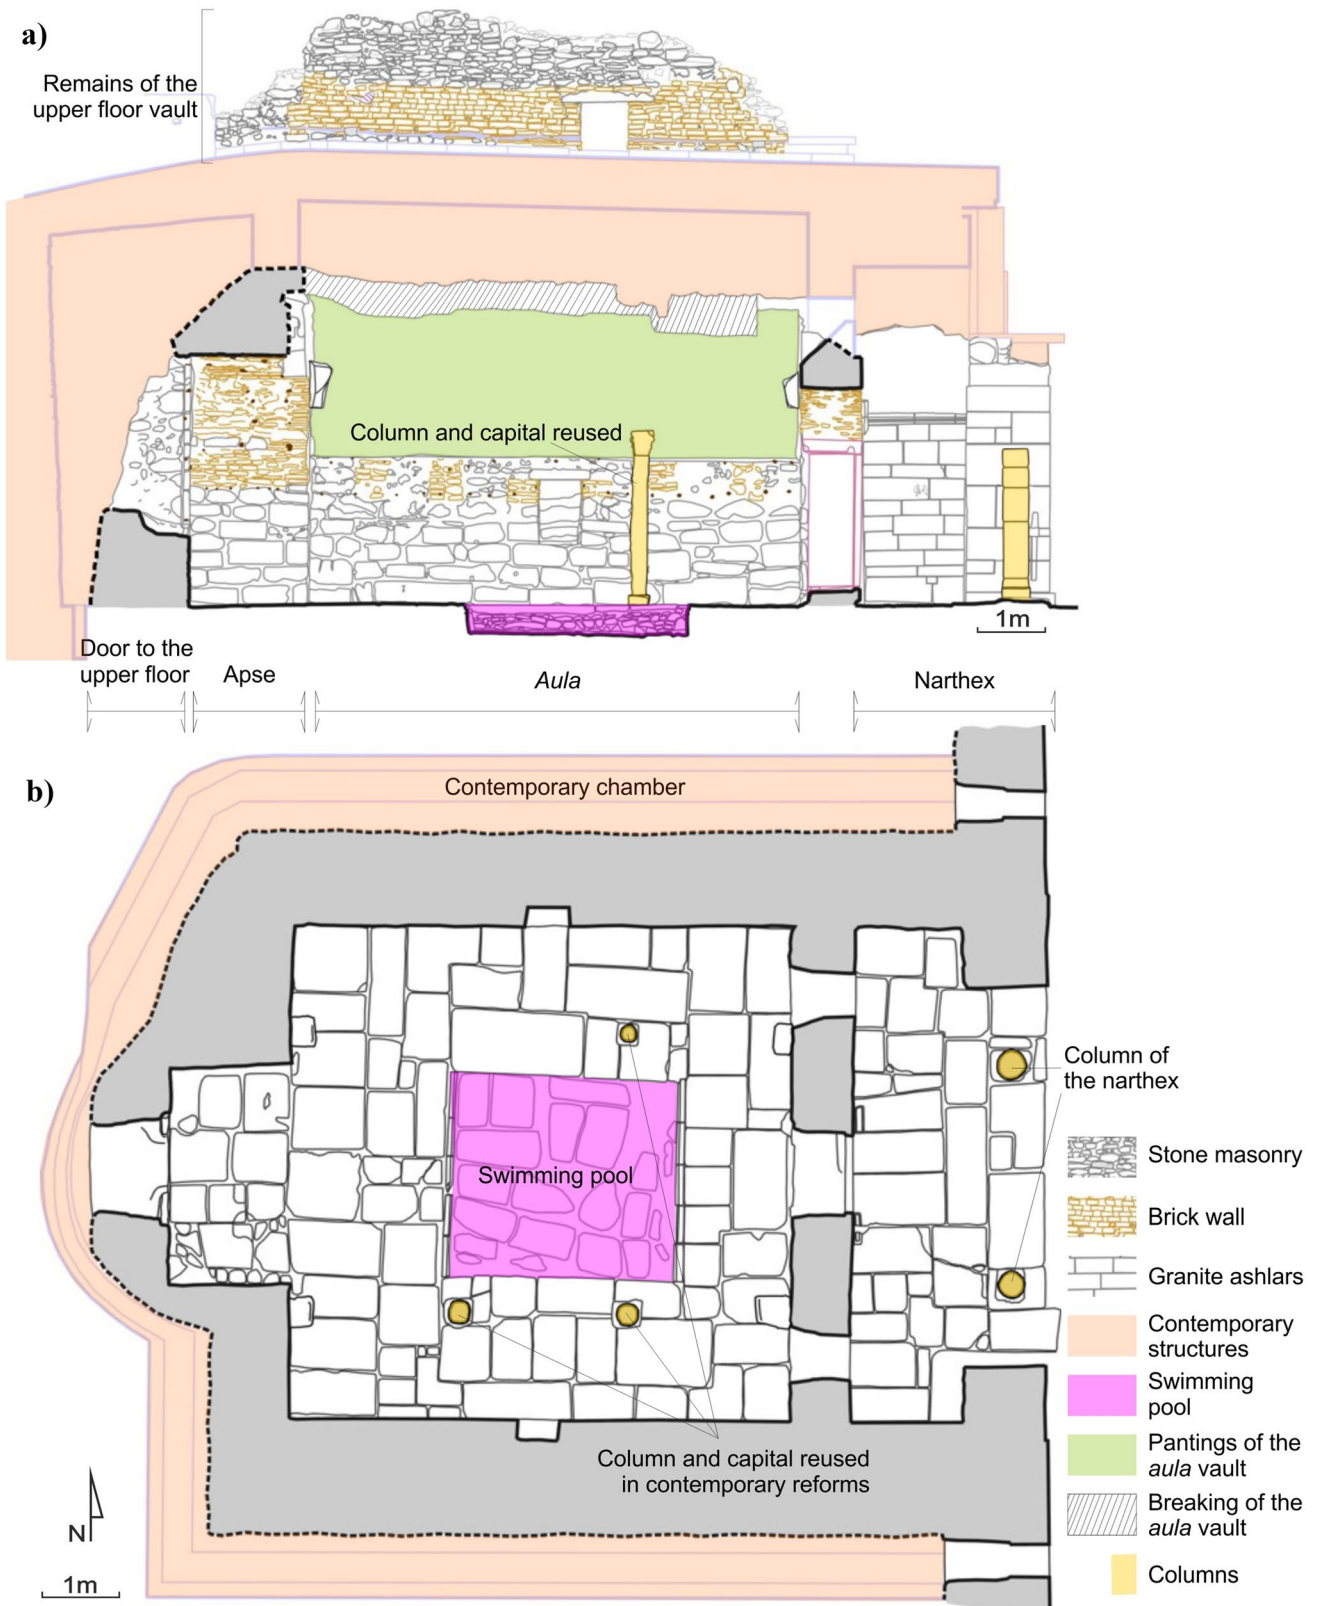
a North elevation of the aula and remains of the upper floor. b Plan of the underground building of the Santalla de Bóveda Monument
